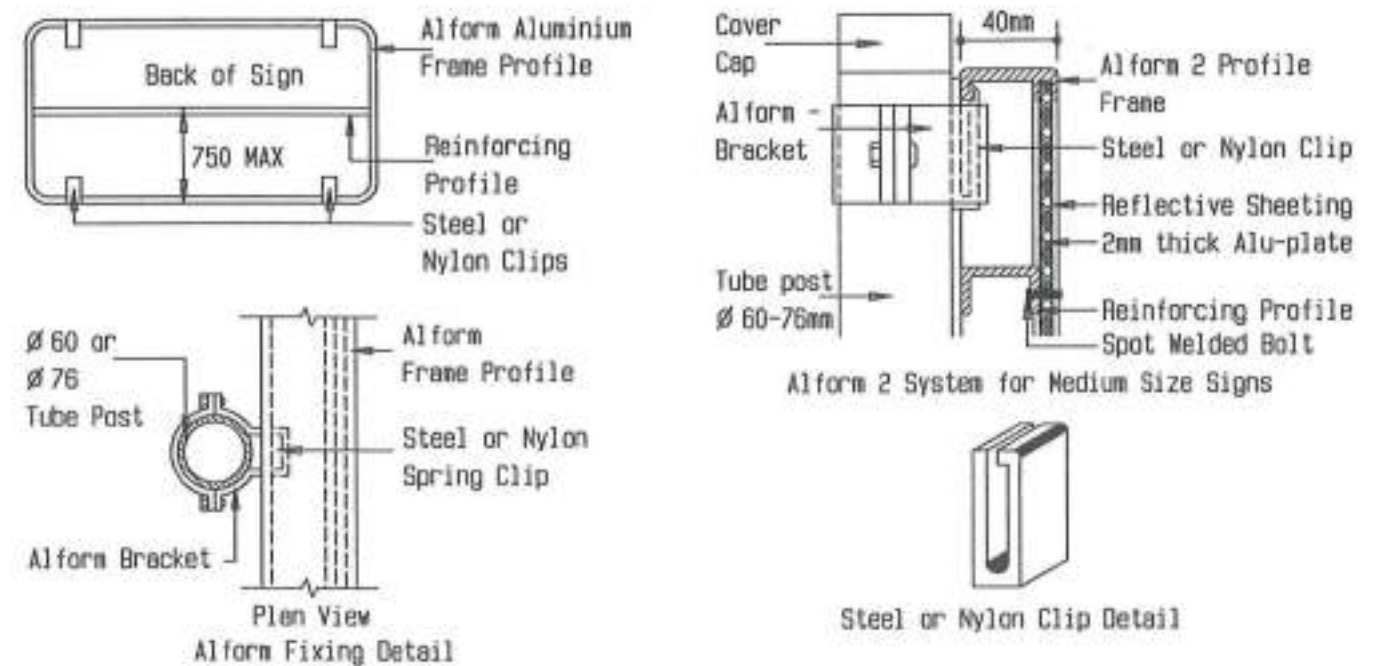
Mounting Brackets for fixing Signs with Channels/Rails
